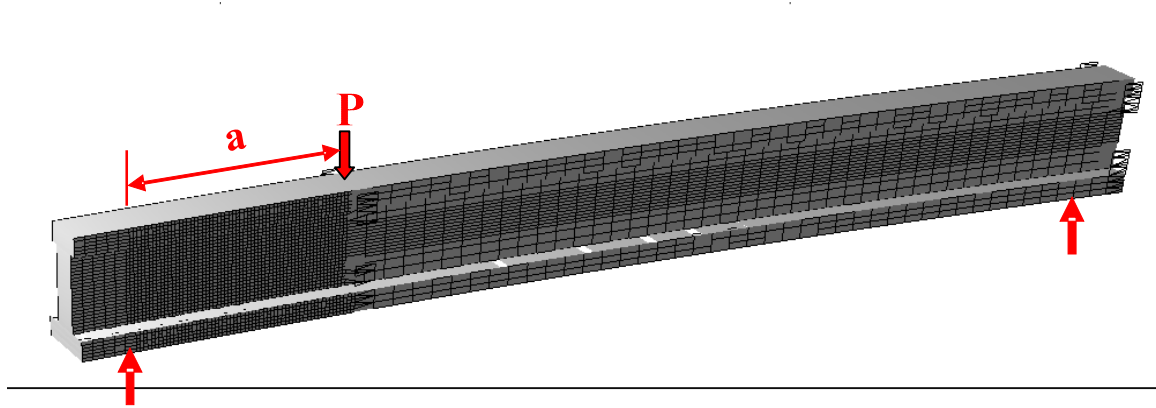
Girder Finite Element Model (Girder1-Test 1).
